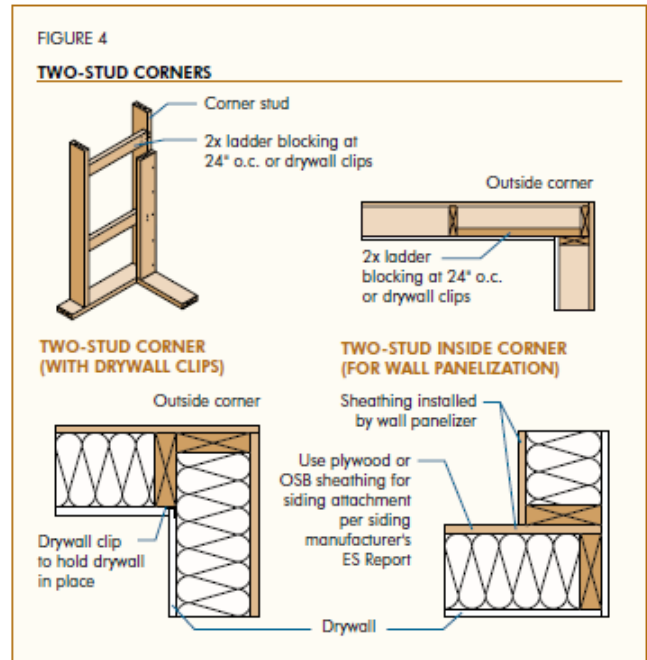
Advanced Framing Wall Intersection (apawood.org)
